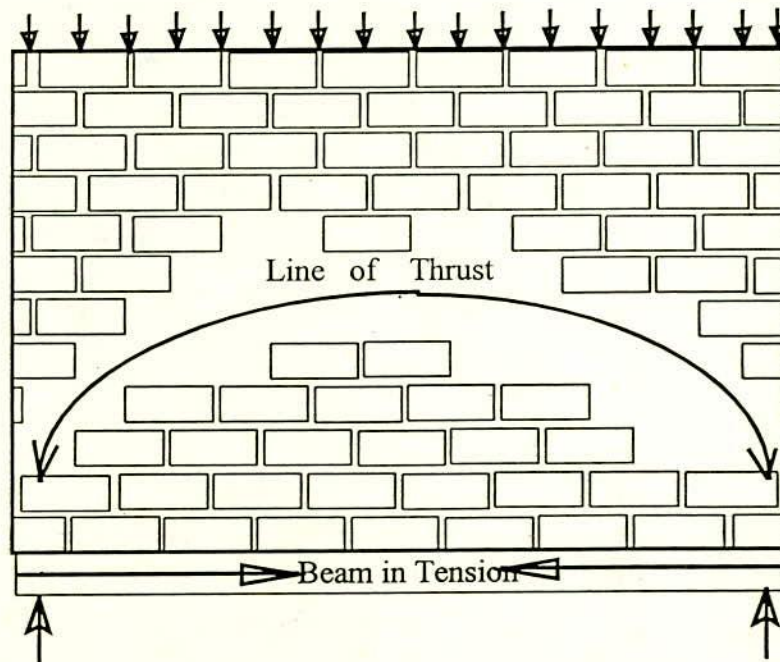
Tied Arch Action of Wall-Beam Structure
